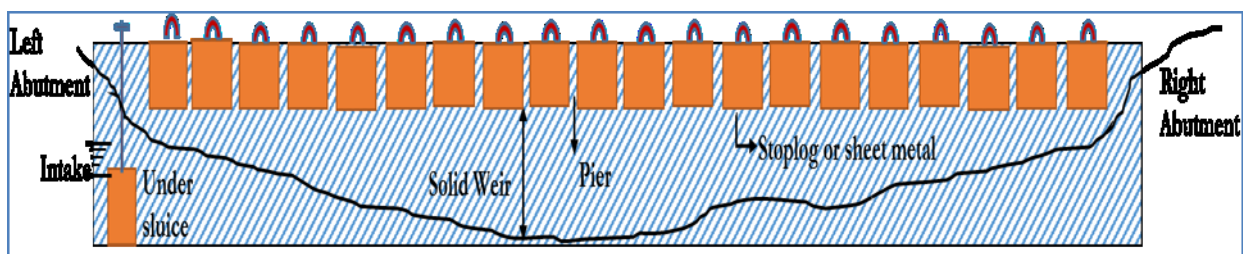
Typical Cross Section through and Arrangement of Barrage Diversion
